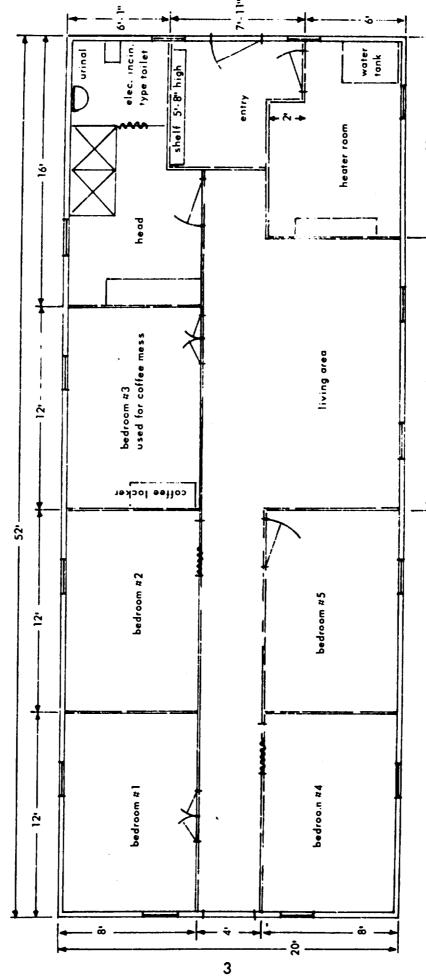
Floor plan of 20- by 52-foot T-5 quarters building.
